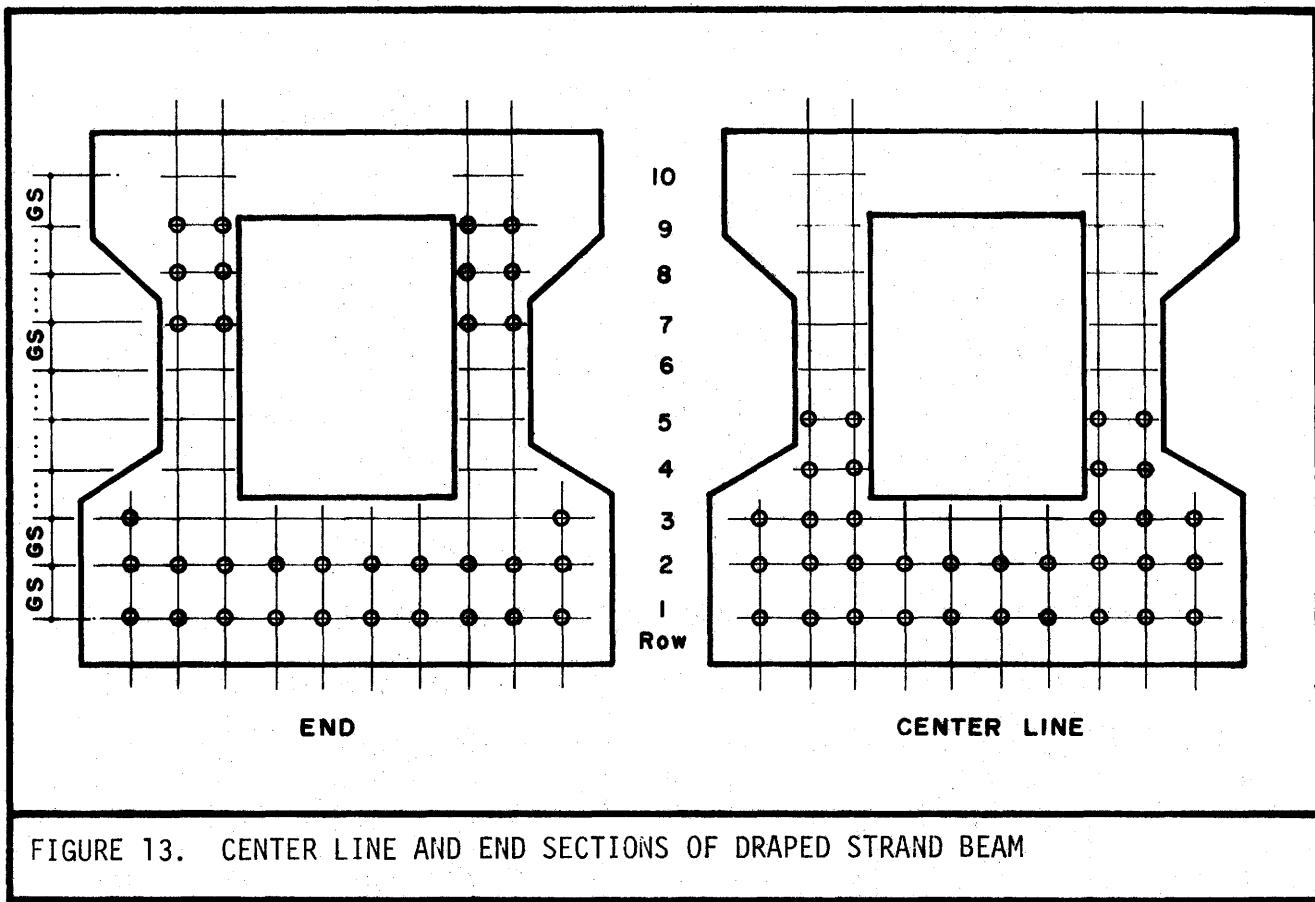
CENTER LINE AND END SECTIONS OF DRAPED STRAND BEAM
